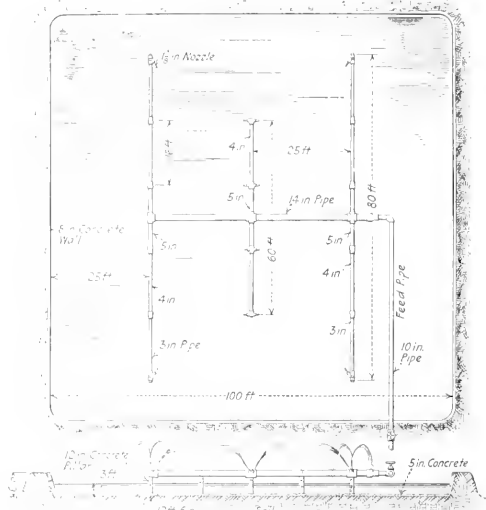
PLAN AND ELEVATION OF COOLING POND
